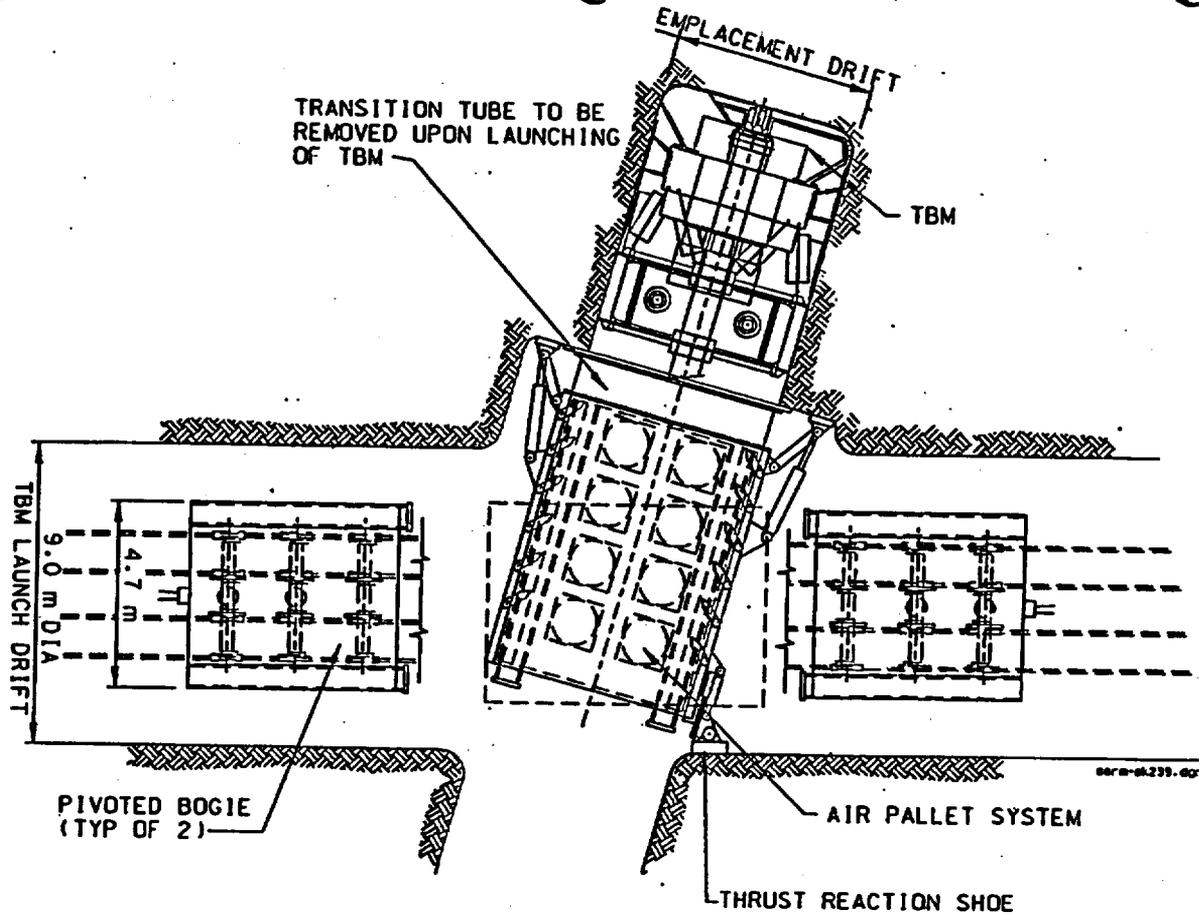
TBM Launch - Air Pallet Concept - Plan View
